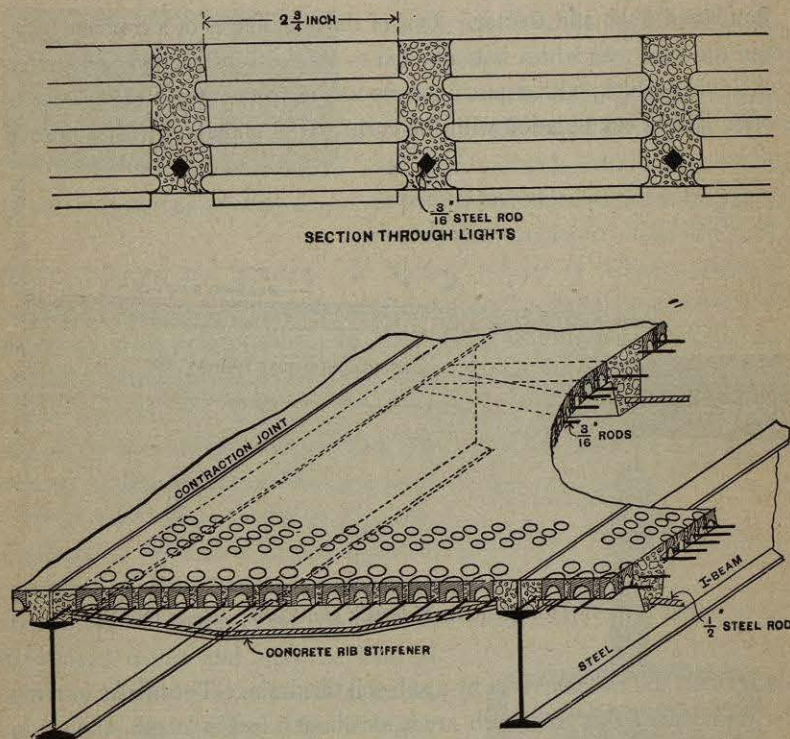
Typical Vault Light Construction. (See p. 602.)
